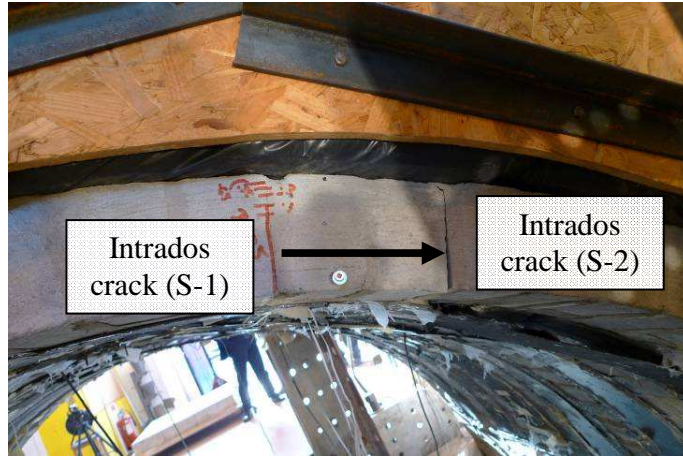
Development of second intrados crack near the loading position - viewed from the west
